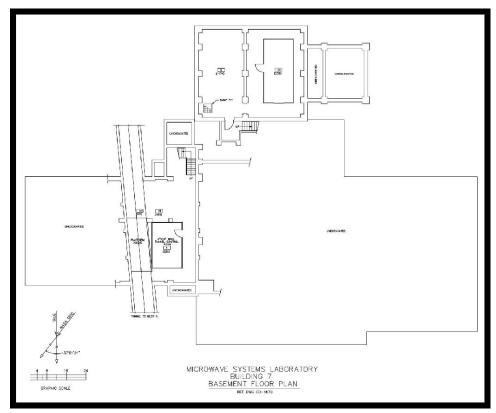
Basement floor plan showing excavated areas and the Duct Lab tunnel, 1992 (OH_Cuyahoga_AWT-Support_038).
